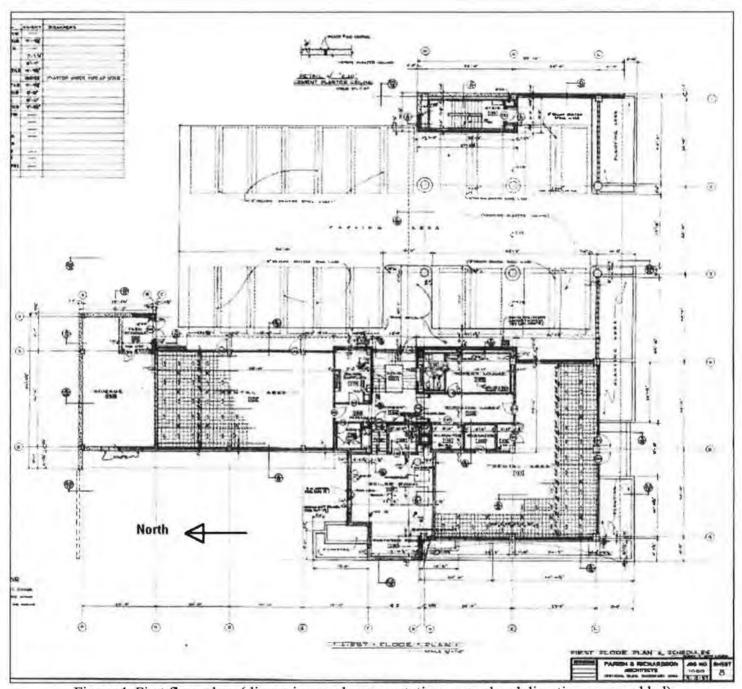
First floor plan, (dimensions and some notations erased and direction arrow added) (Original architect's drawings, 1957 in the owner's archives)
